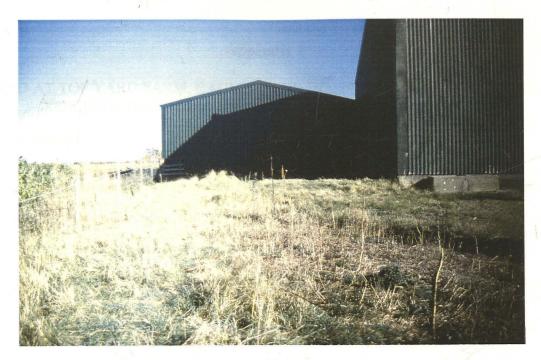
General view looking towards the position of the new aerial mast, looking north
